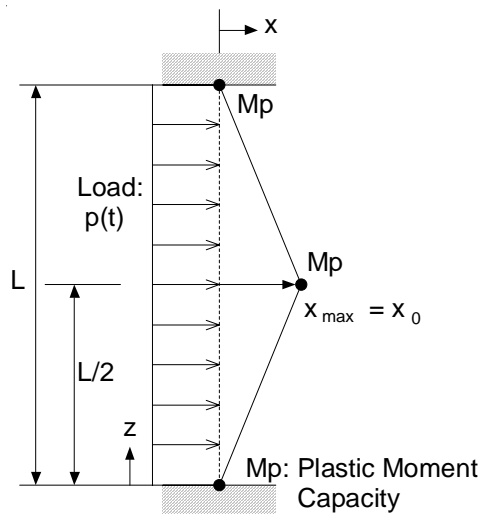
Plastic Deformation of Fix-Fix Supported Column
